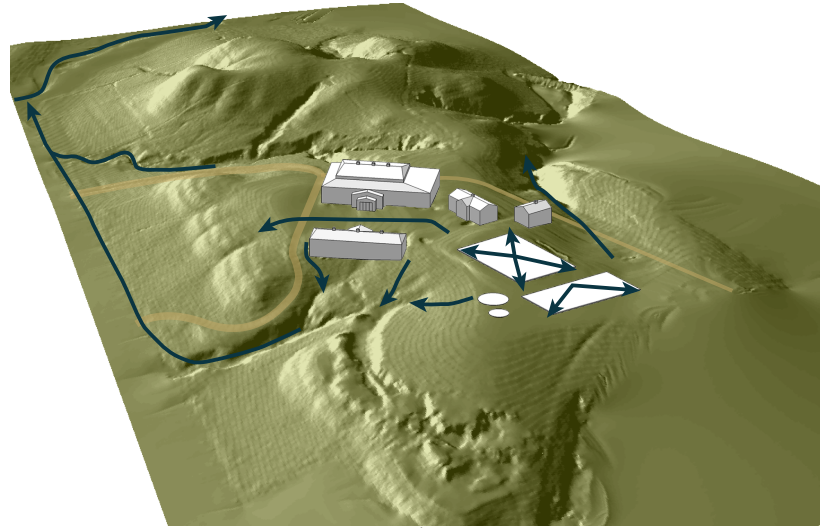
Alternative B 3D Massing / Drainage Study looking Notheast
